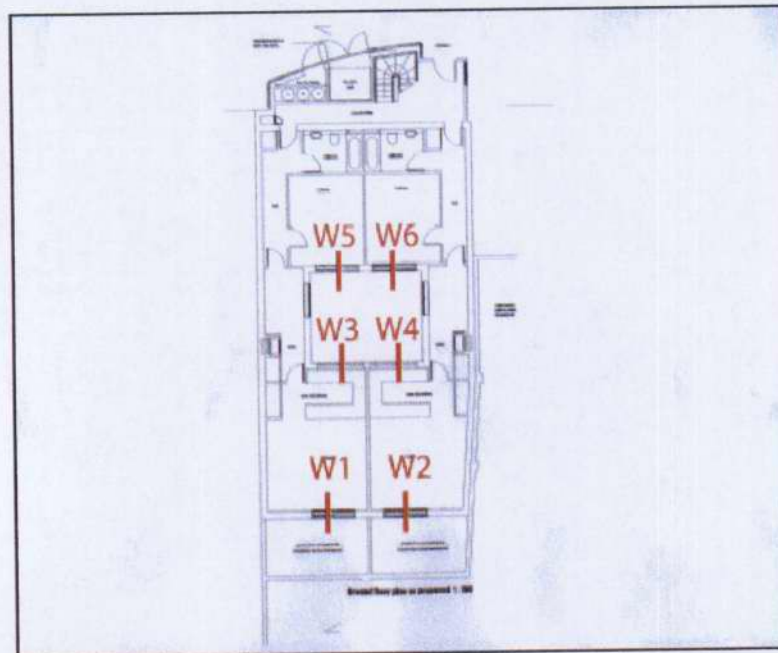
Window location plan for sunlight/daylight assessments to existing buildings.
